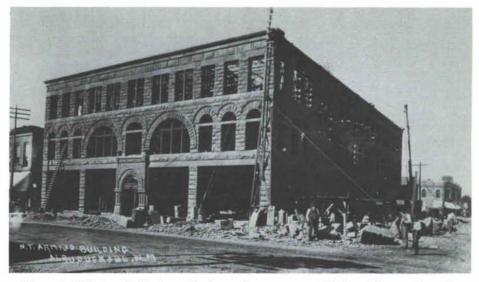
N.T. Armijo Business Block, northwest corner of Railroad Avenue (now Central Avenue) and Second Street, Albuquerque, New Mexico. Architect - Jesse M. Wheelock; Builder - Berardinelli & Palladino. Constructed 1892 - Demolished 1969. (Albuquerque Museum Photoarchives)
